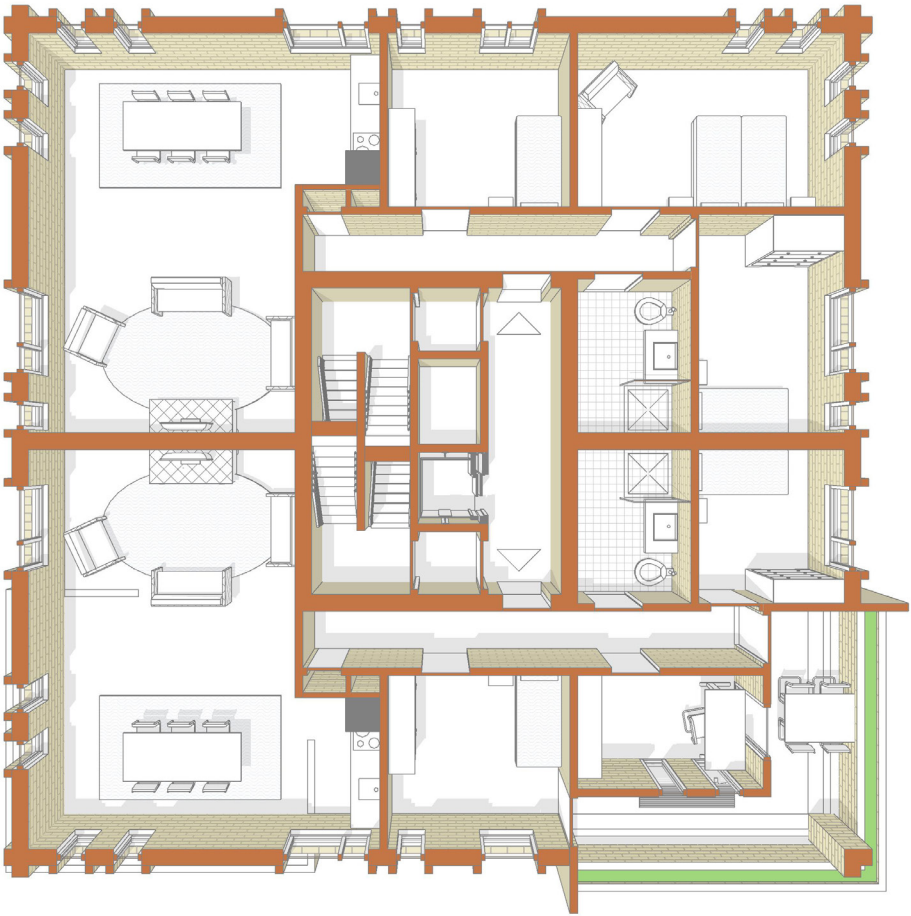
Typical Floor Plan 3-Bedroom Apartment in Tower [Scale 1:100]
